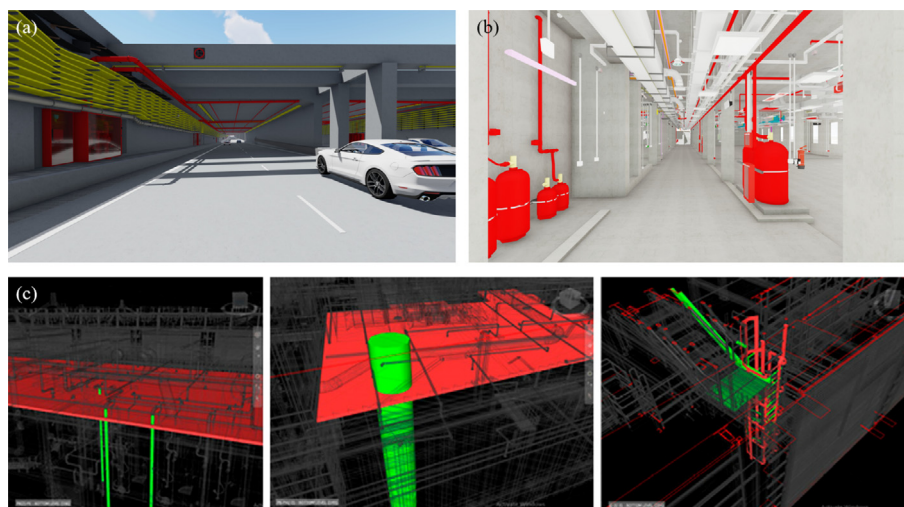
Applications of underground BIM in Singapore. (a) A road tunnel, (b) a fire station, and (c) an underground subway station with piping, cables, and other facilities (reproduced with permission, courtesy of Hyundai).
